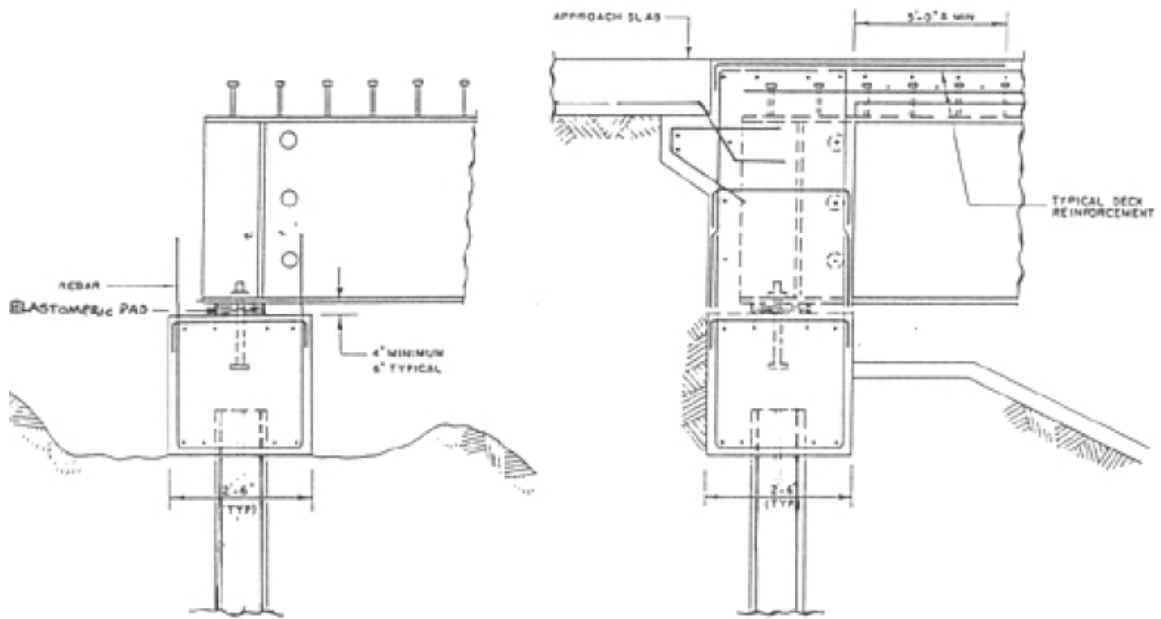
Integral abutment detail with elastomeric pad bolted between the pile cap and girder (Wasserman and Walker 1996)
